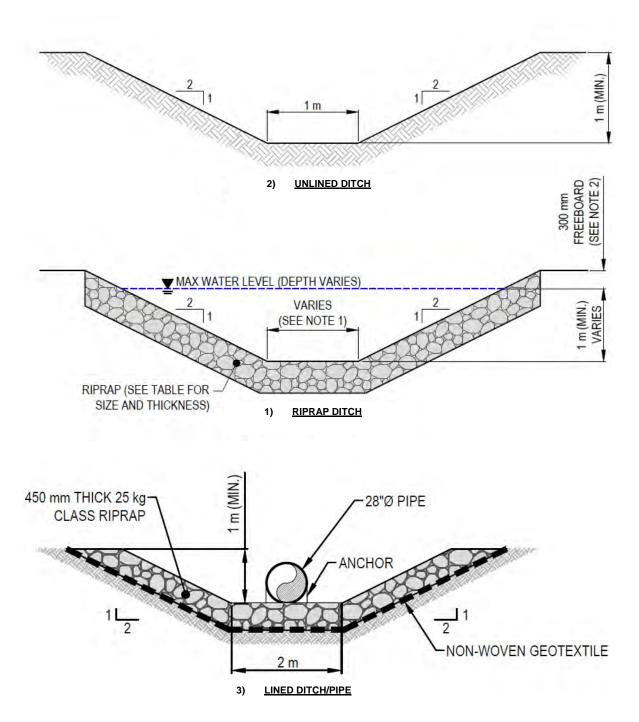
Erosion Control BMP - Sections and Details - Sheet 2 of 2
